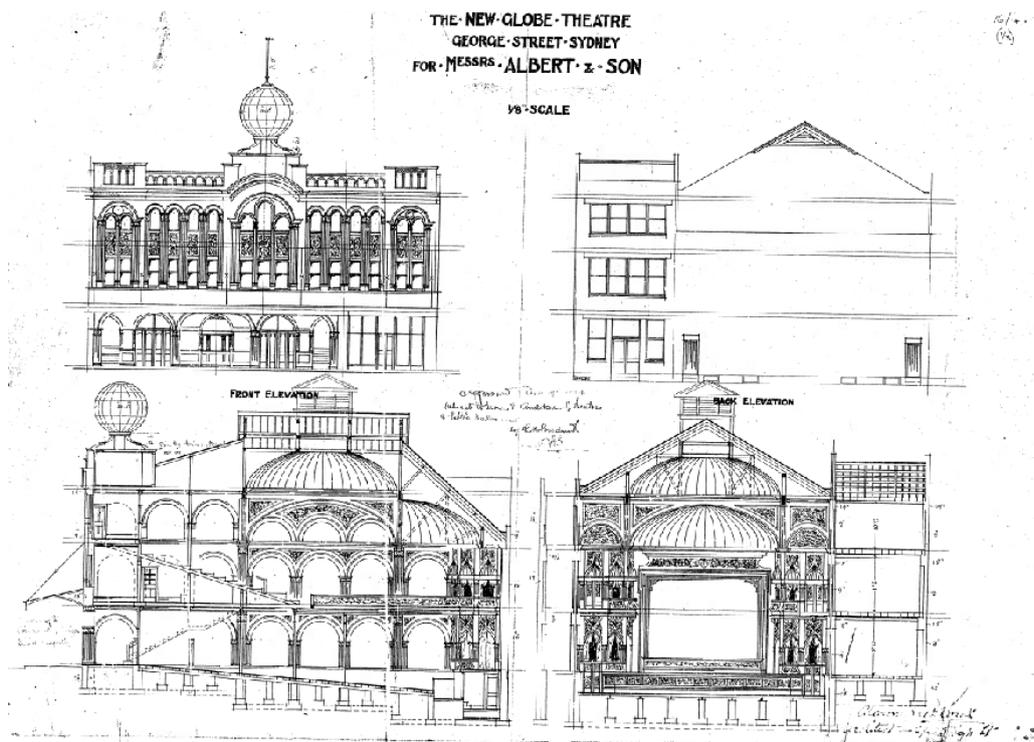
Extracts of the 1914 elevation and section drawings of the Globe Theatre
